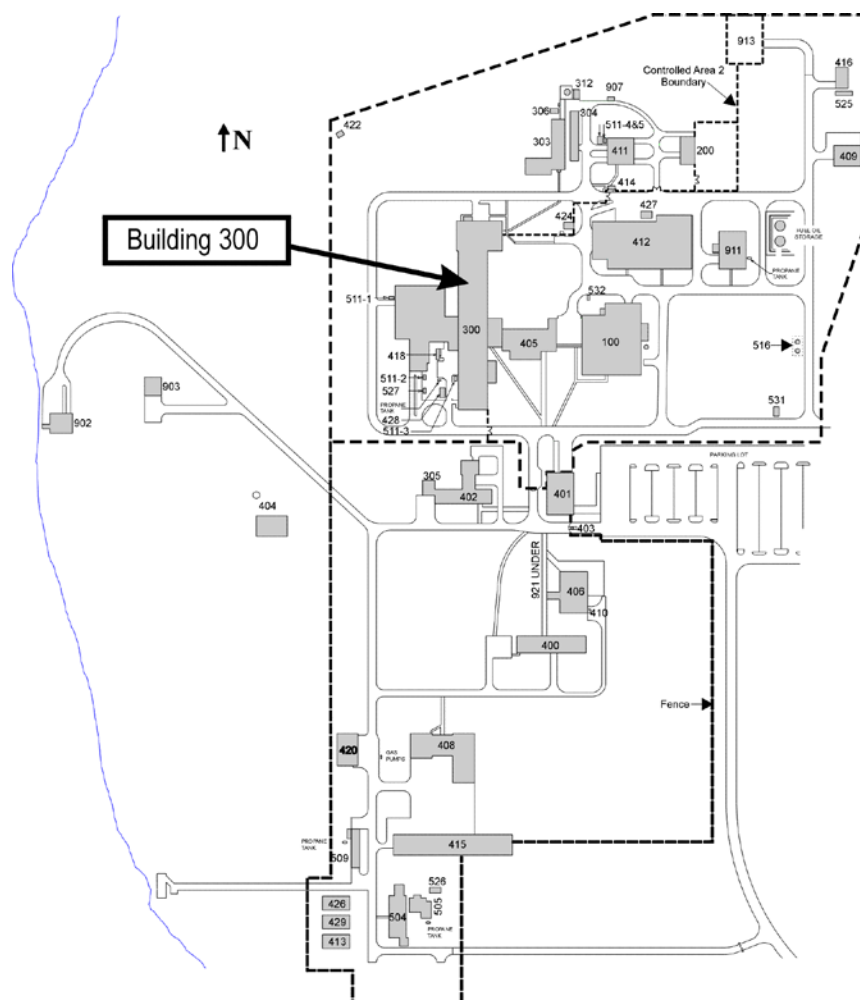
Whiteshell Laboratories Site Plan Showing Building 300
